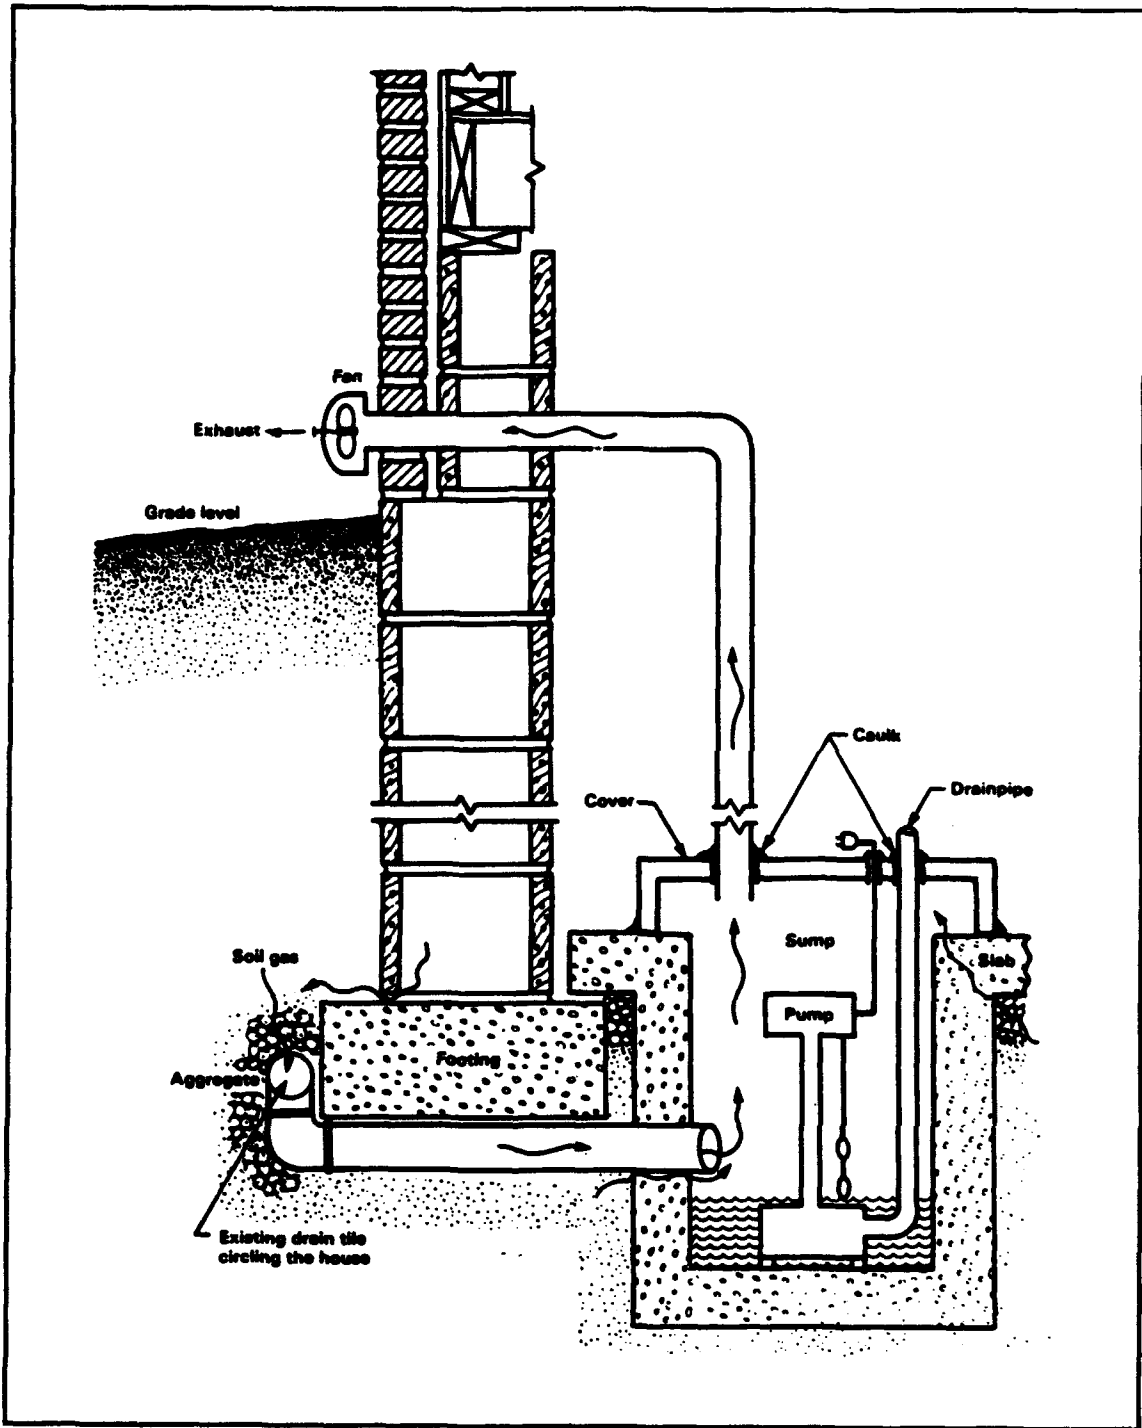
Drain Tile Ventilation Where Tile Drains to Sump
